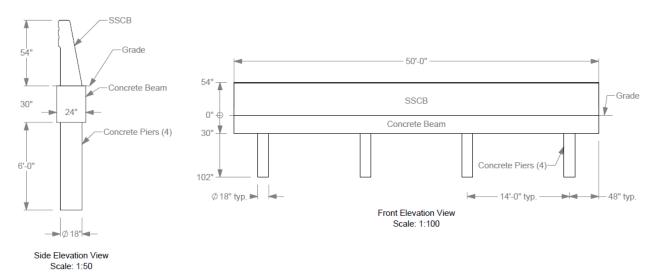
Concept 3 – Drilled Shaft with Concrete Beam Design.
